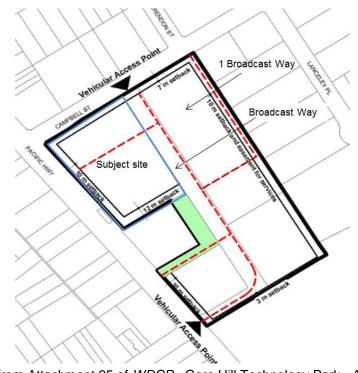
Extract from Attachment 25 of WDCP - Gore Hill Technology Park - Access routes, open space areas and building setbacks
